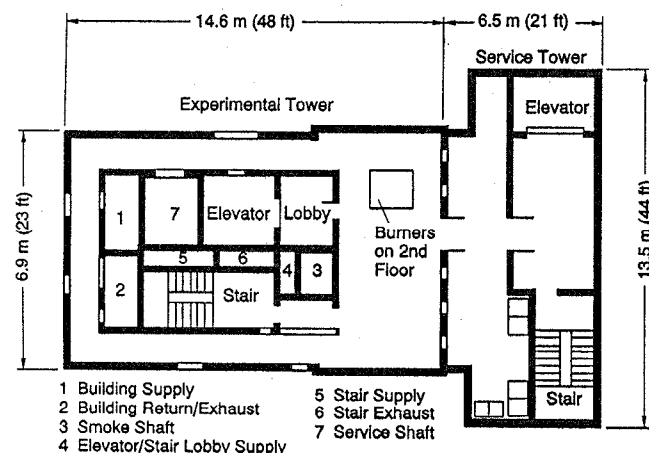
Typical floor plan of the experimental fire tower near Ottawa.
